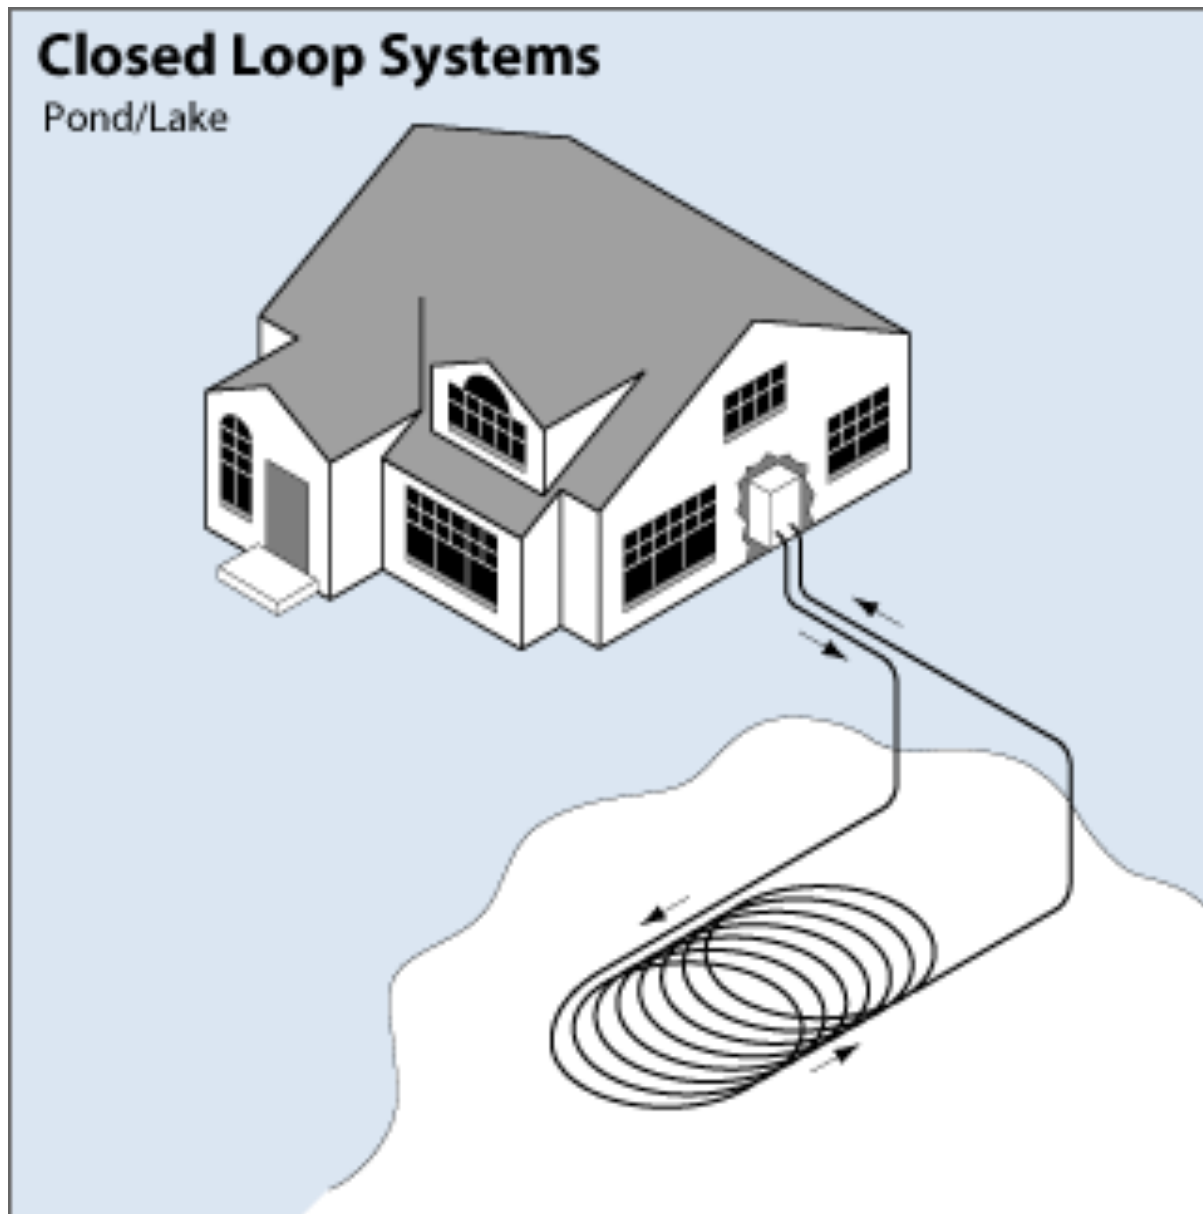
Closed Loop Pond/Lake Heat Pump System
